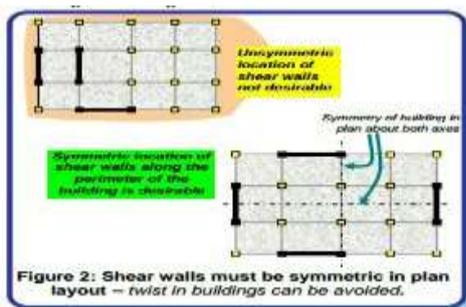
Shear walls must be symmetric in plan layout – twist in buildings can be avoided.
